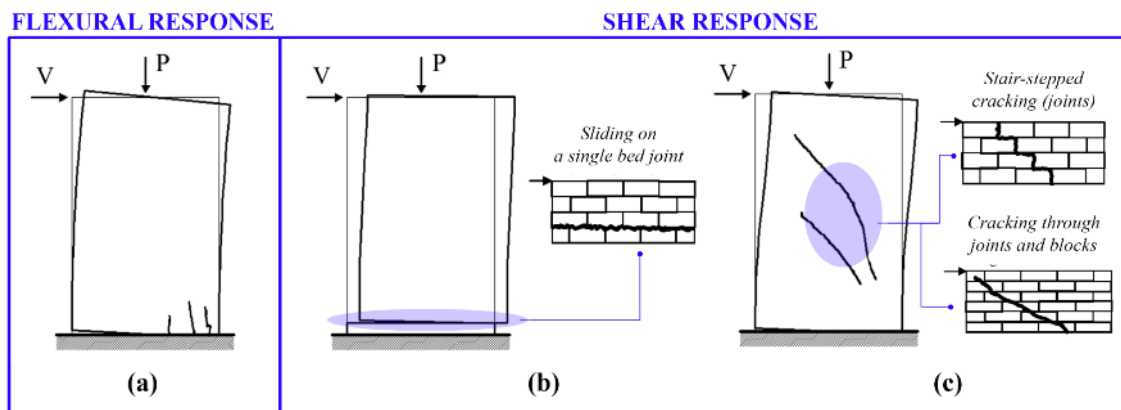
Main in-plane failure mechanisms of a masonry panel: (a) flexural failure, (b) shear sliding failure and (c) shear diagonal failure.
